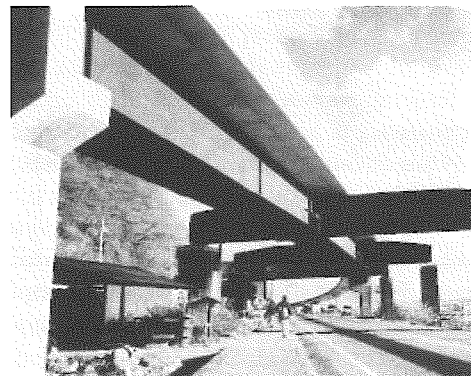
Example #1 of application of nickel containing advanced weathering steels (Hokuriku Shinkansen Line [railroad], Hokuriku over-road bridge)
